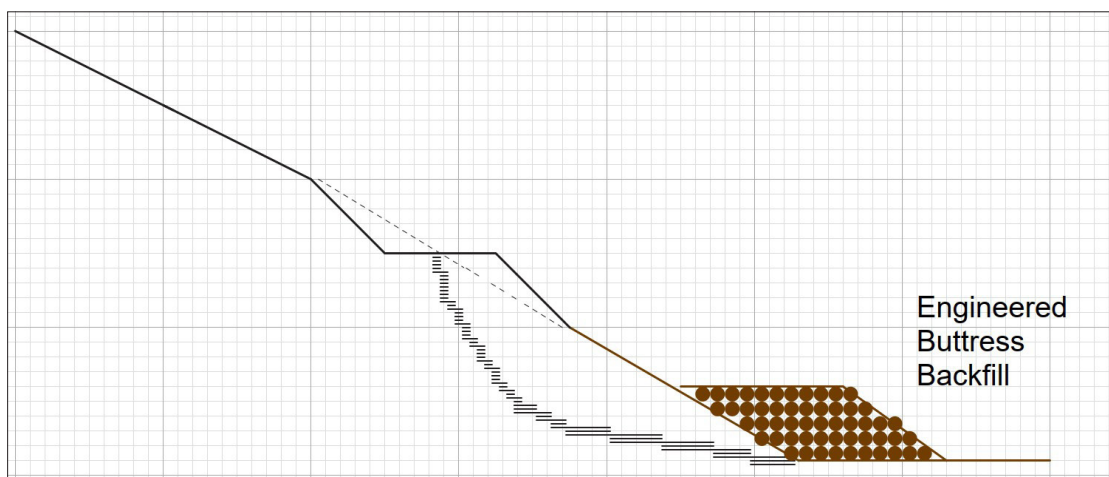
Butress fill slope stabilisation example (generalised schematic representation)
